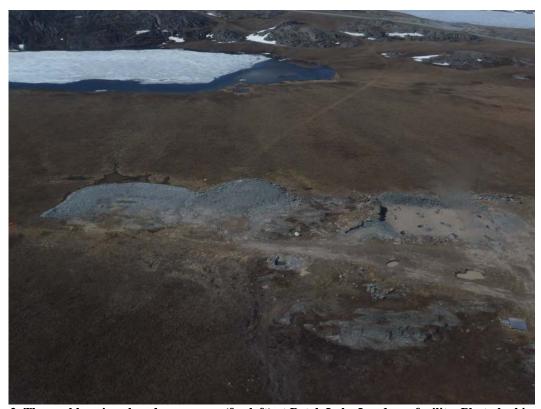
Thermal barrier placed over sump (far left) at Patch Lake Laydown facility. Photo looking West.
